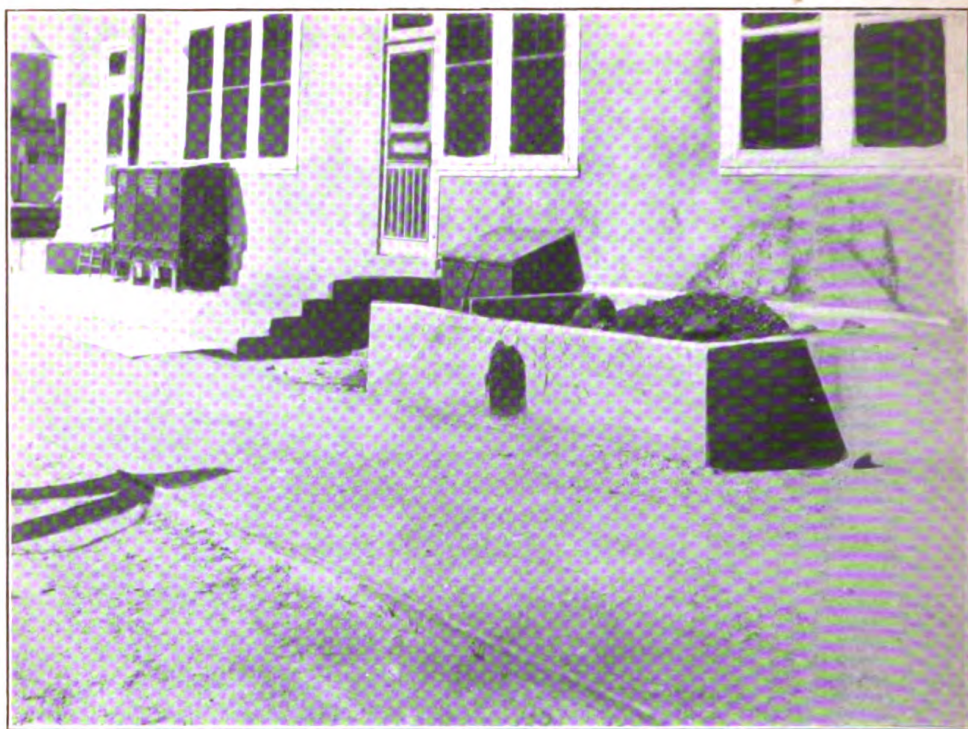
Concrete coal bin replacing wooden coal box. At the left, concrete platform provided for garbage cans and potato locker.
